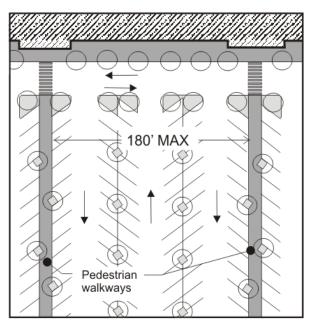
E.2.b. Example parking area pathway configuration.
